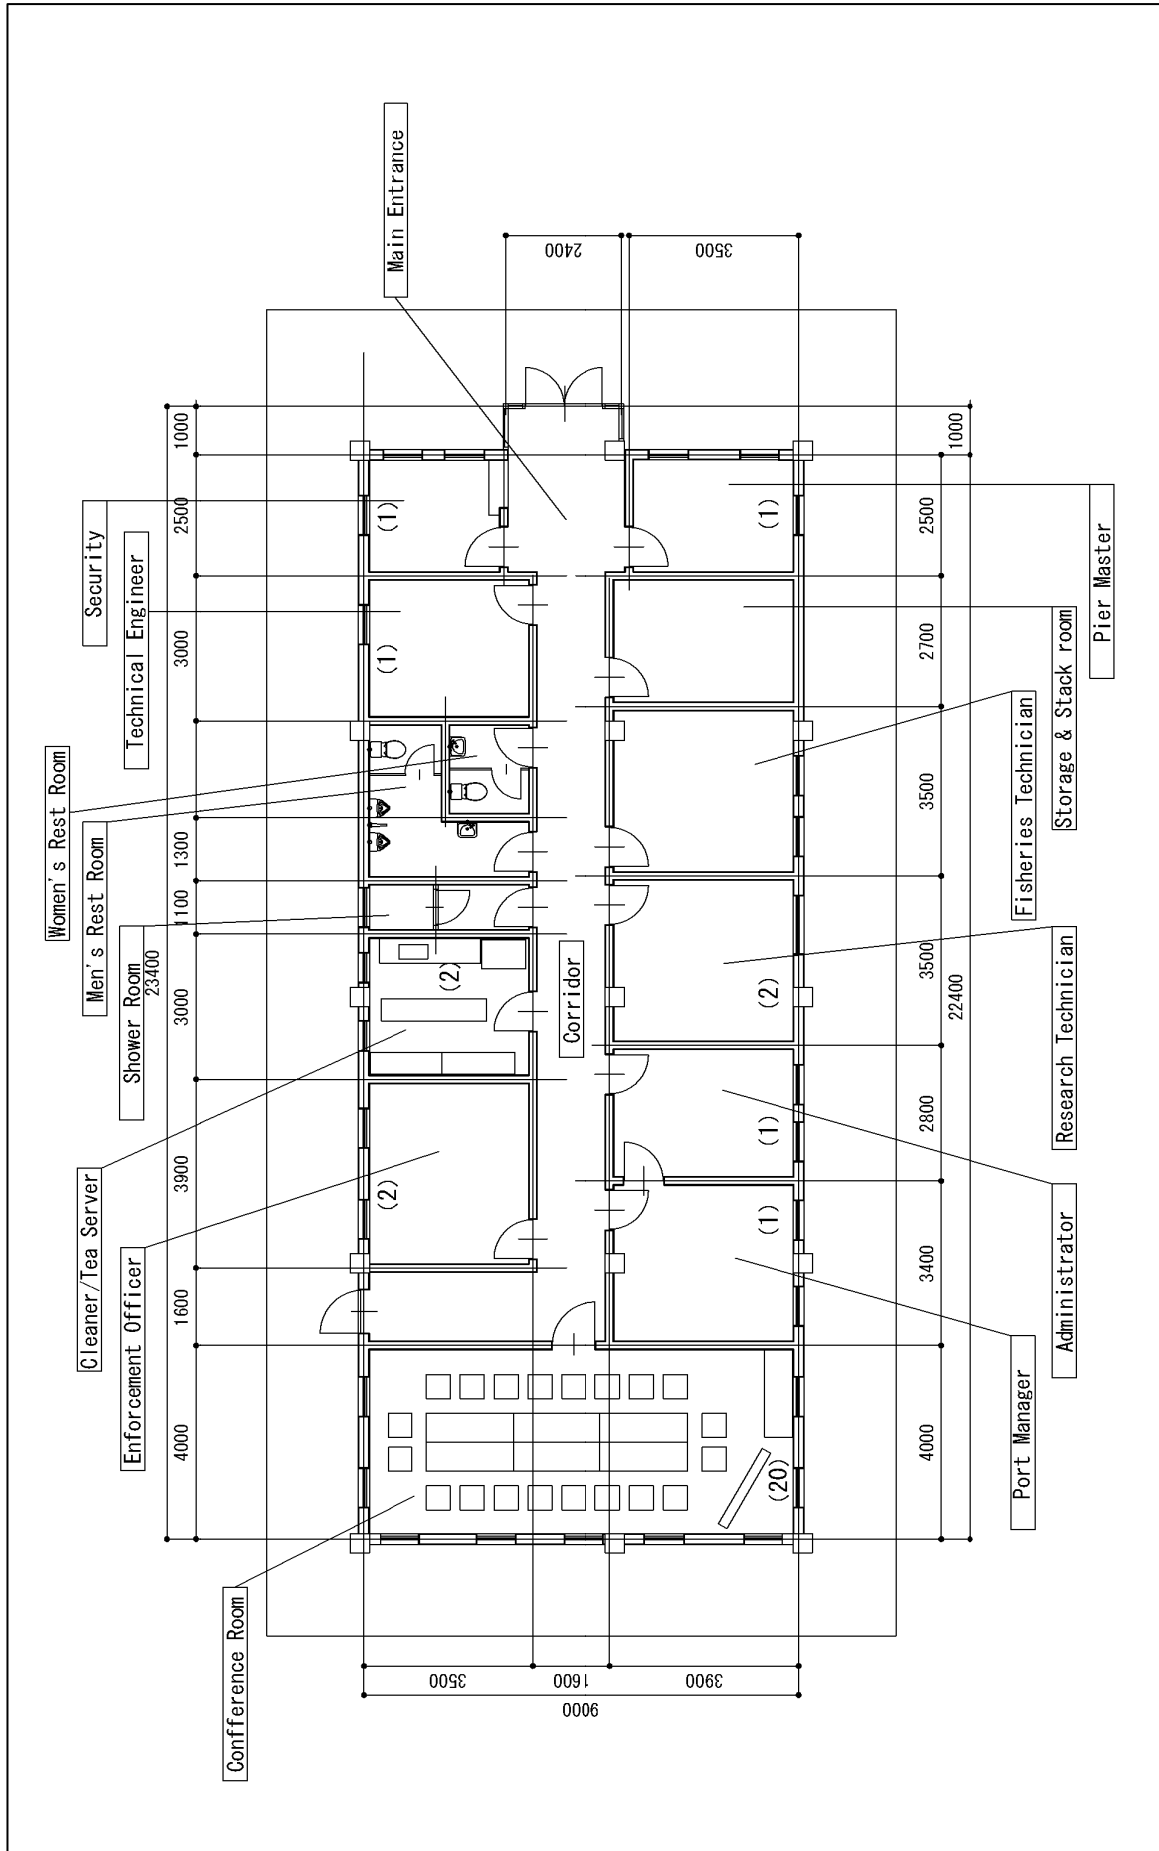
(4) Layout Plan of Administration Building (Providence)
